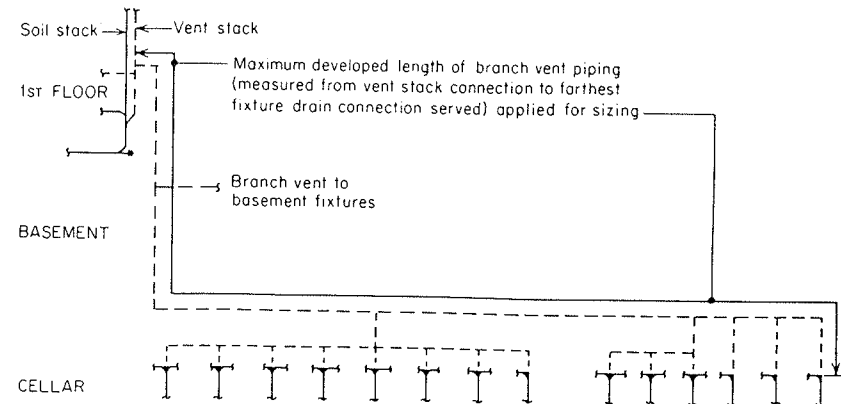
Developed length applicable to sizing branch vent drops to lower floor fixtures.
